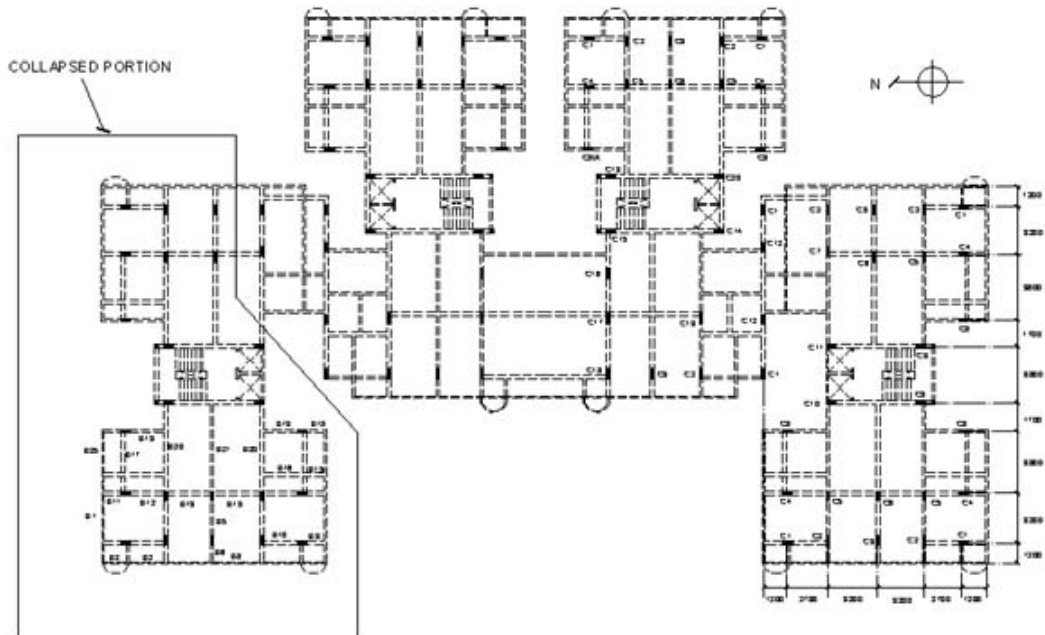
Plan of a Typical 10-story Building at Ahmedabad
